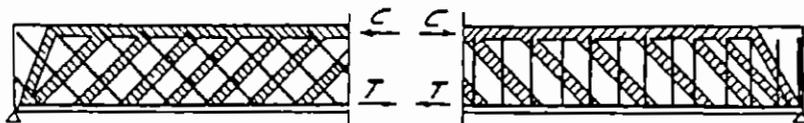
Action of a simple reinforced concrete beam as a complex truss
